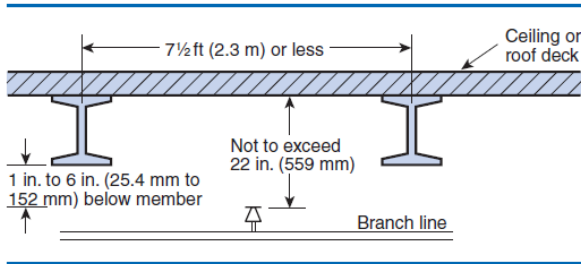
Placement of Standard Spray Upright Sprinklers Underneath Obstructed Construction.
